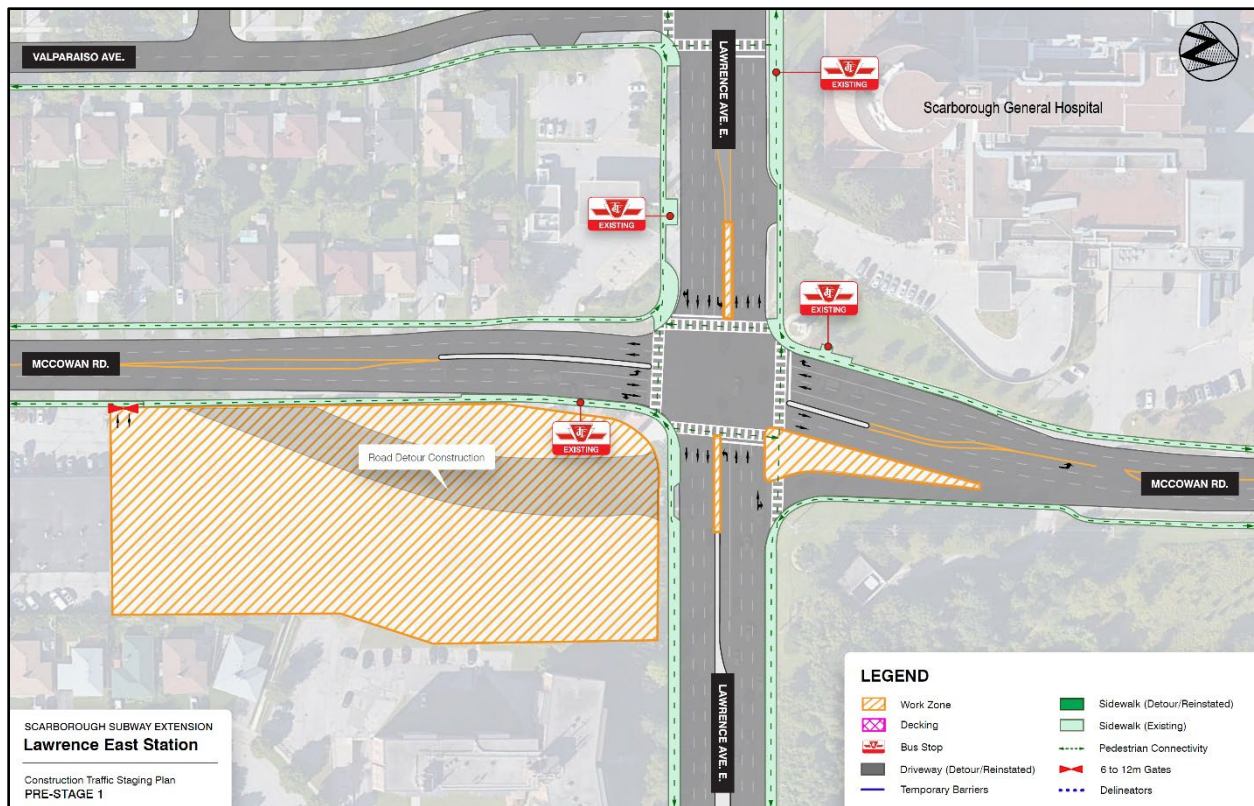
SSE Lawrence East Station Construction Pre-Stage 1
